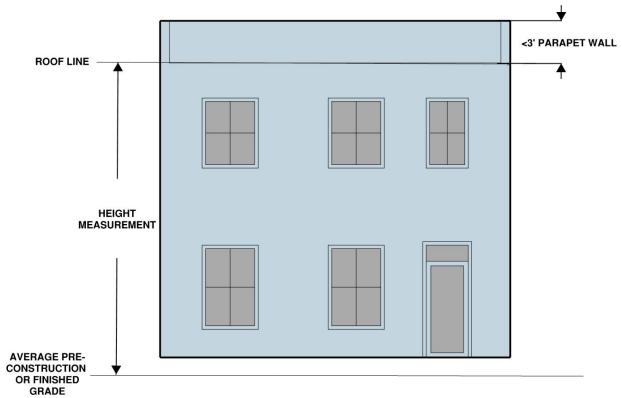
flat roof: height is measured to roofline because parapet wall is less than three feet in height.
